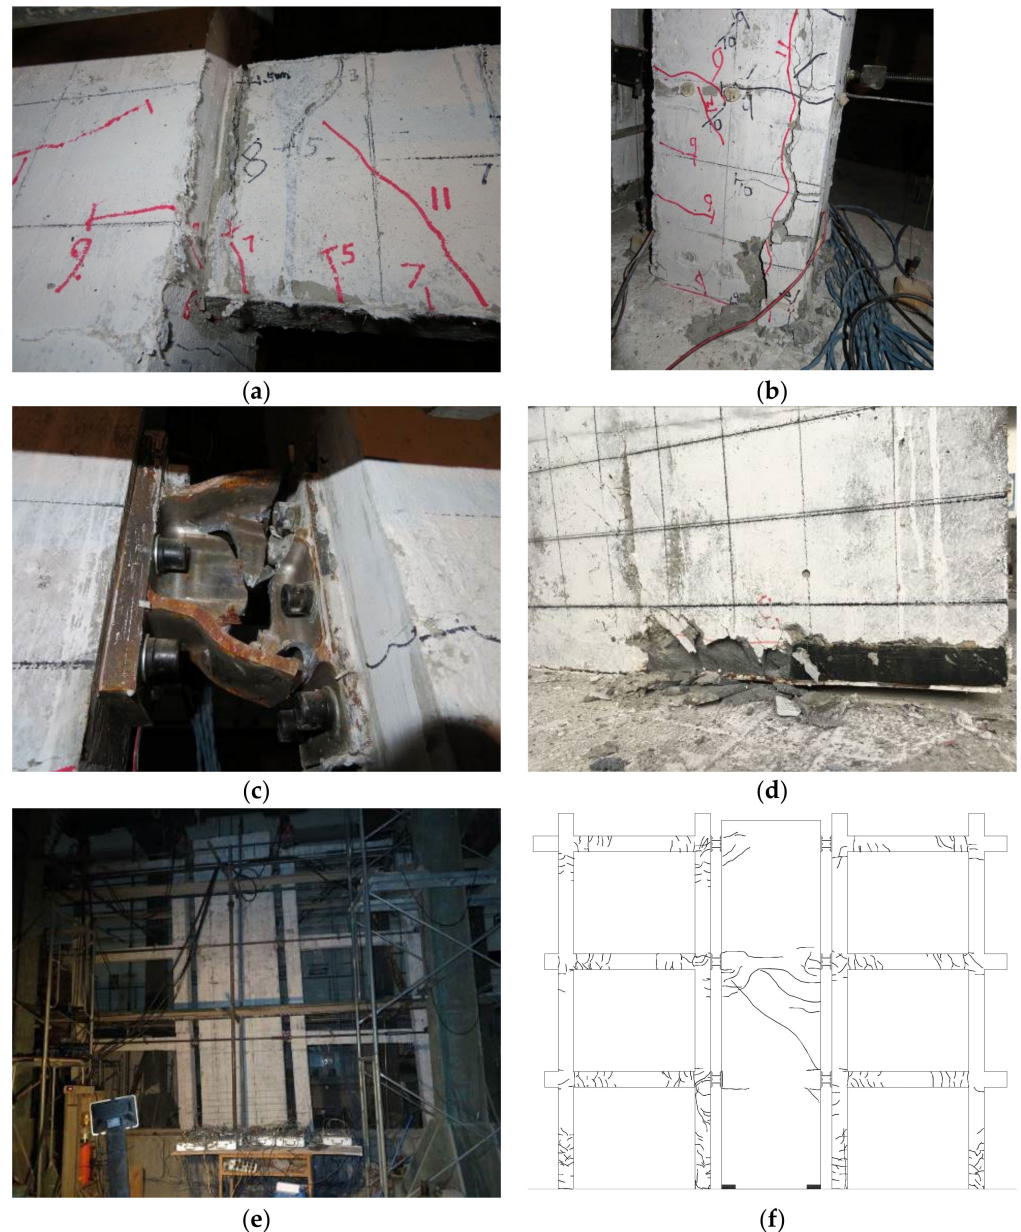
Damage of PFRW structure. (a) damage of first story beam at face of column A at $+H/30$; (b) damage at base of column C at $+H/30$; (c) damage to first story energy-dissipating connector at $-H/30$; (d) uplift and spalling at the base of the rocking wall at $-H/30$; (e) overall view of PFRW at $-H/30$; (f) final crack distribution.
